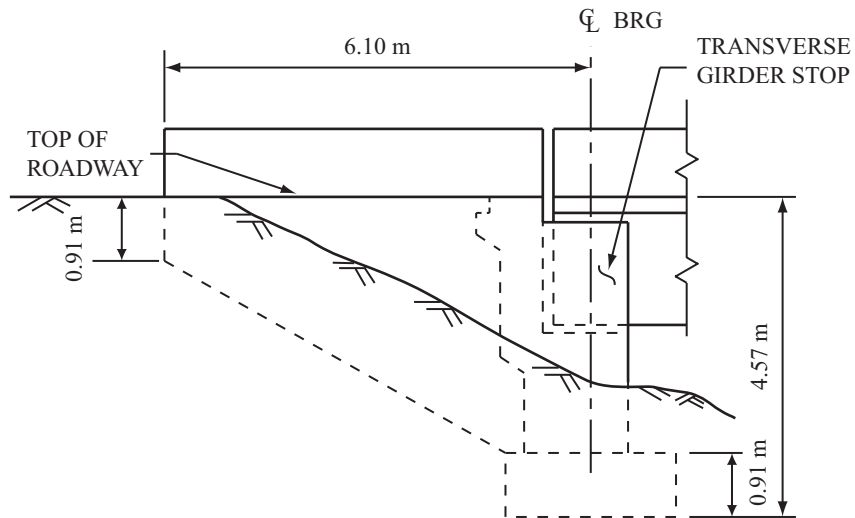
The wingwall elevation view of the FHWA No. 4 bridge (Courtesy of the FHWA).
